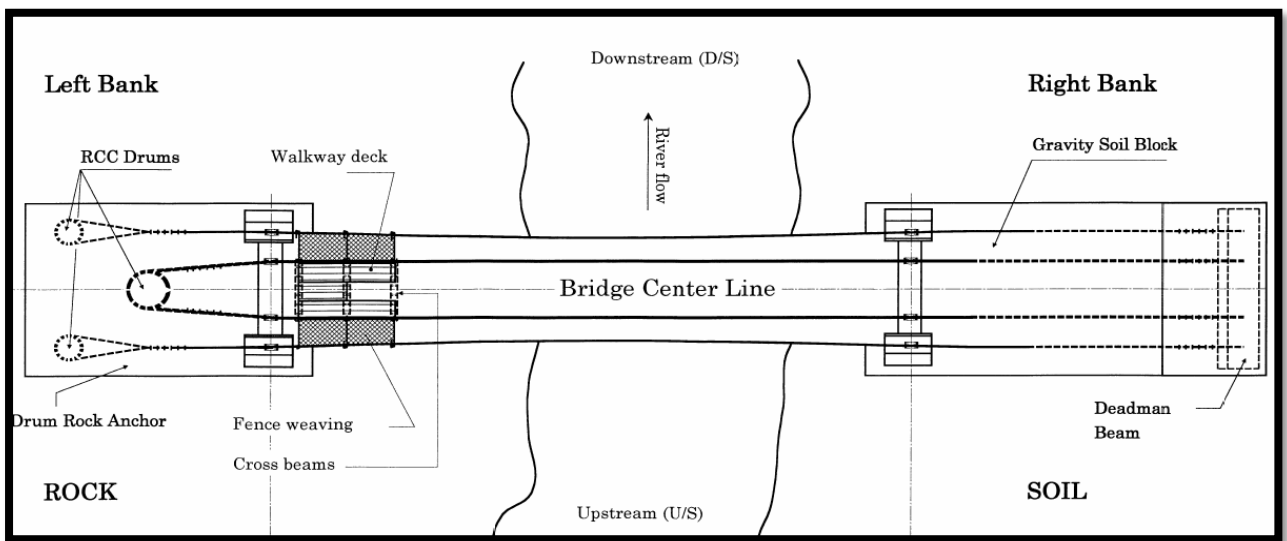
Cable suspended Pedestrian bridge typical plan View [6].
